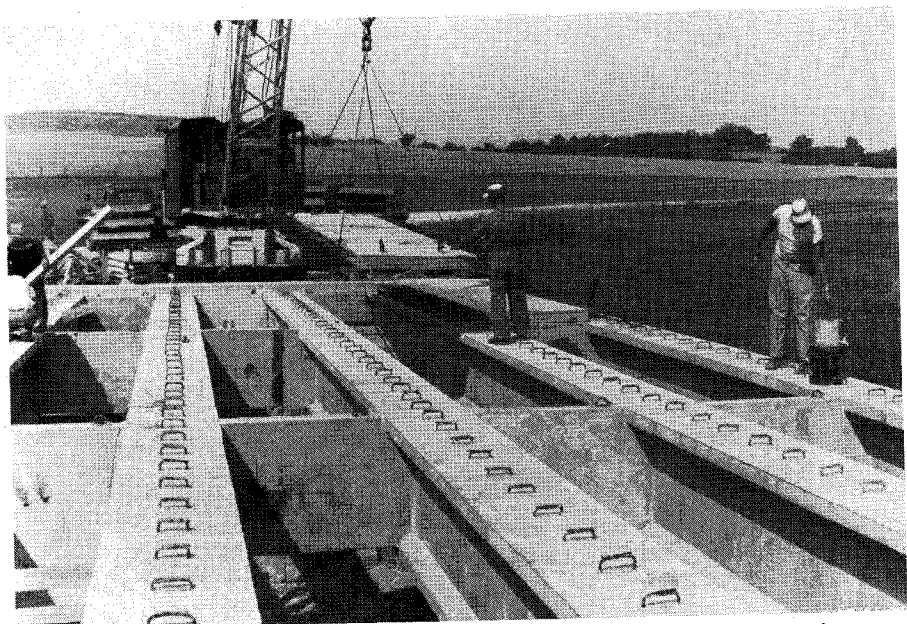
Ezell Pike Bridge, 80-ft (24.4 m) girders with deflected strands and precast deck slabs. Built in 1954.
